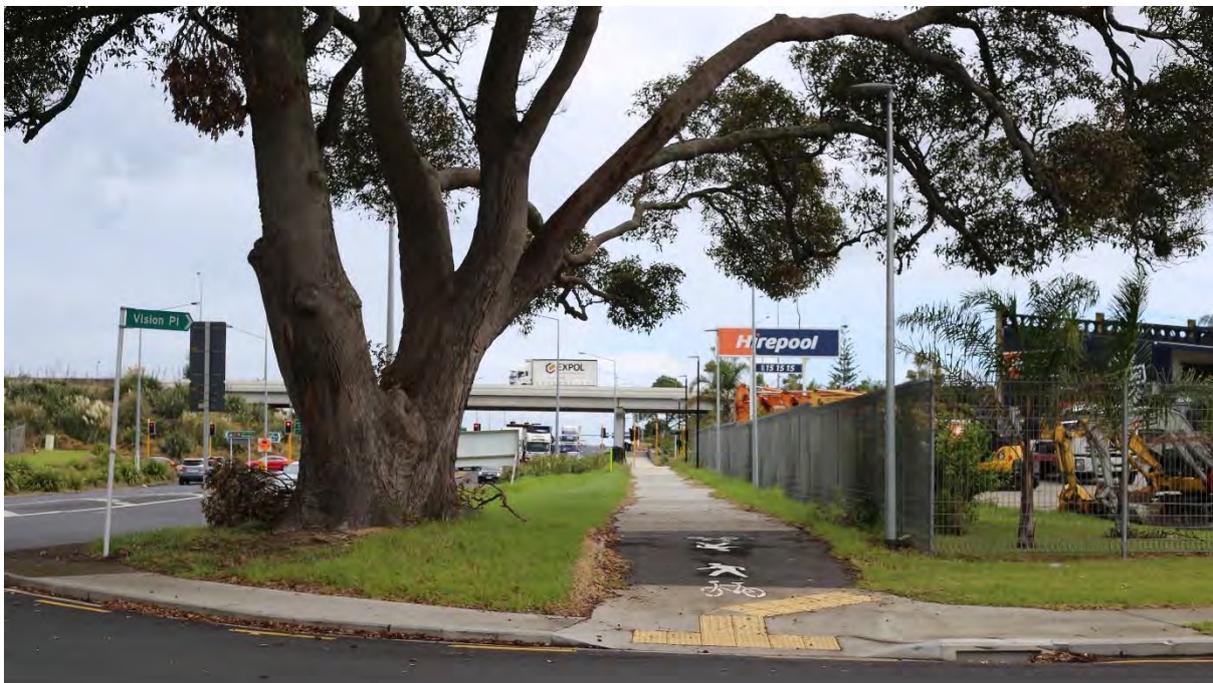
View from Vision Place to the west, includes a notable tree (Flowering Gum) and SH20 bridge over Puhinui Road with planted abutments
